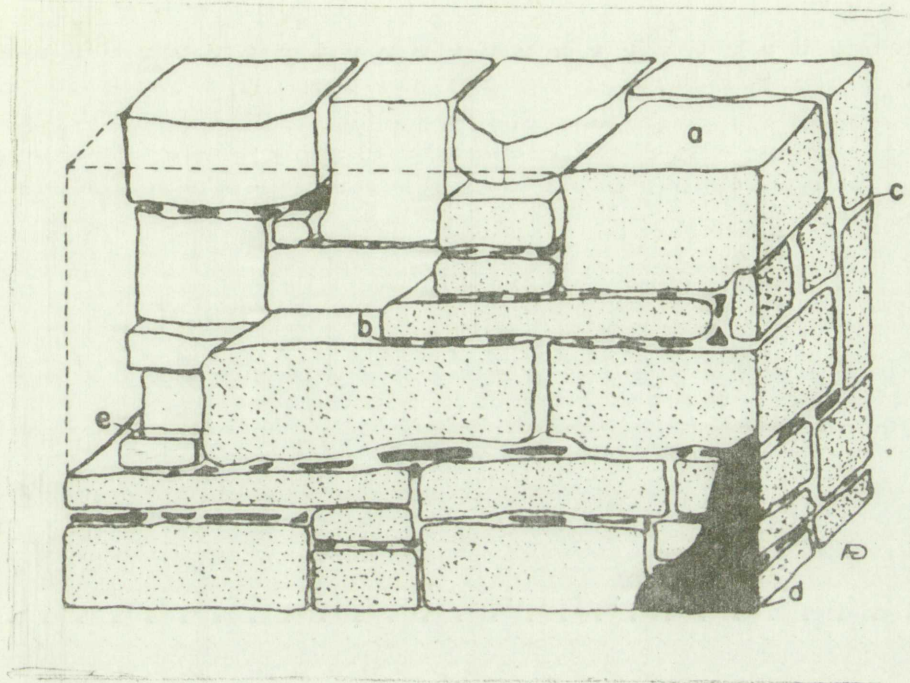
Pecked sandstone masonry: a. shaped and pecked sandstone block, b. sherd and sandstone spalls, c. adobe mortar, d. plaster and e. shaped but unpecked sandstone block.
